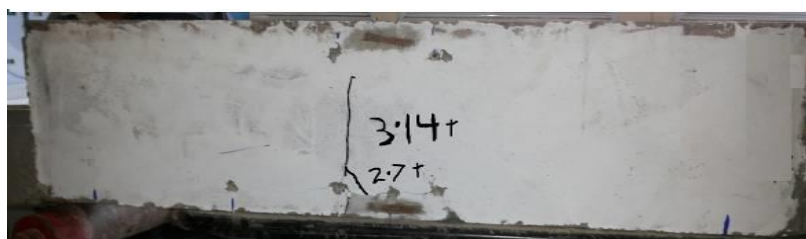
Crack pattern and mode of failure of the fully prestressed beam with CNT (FP-CNT)
